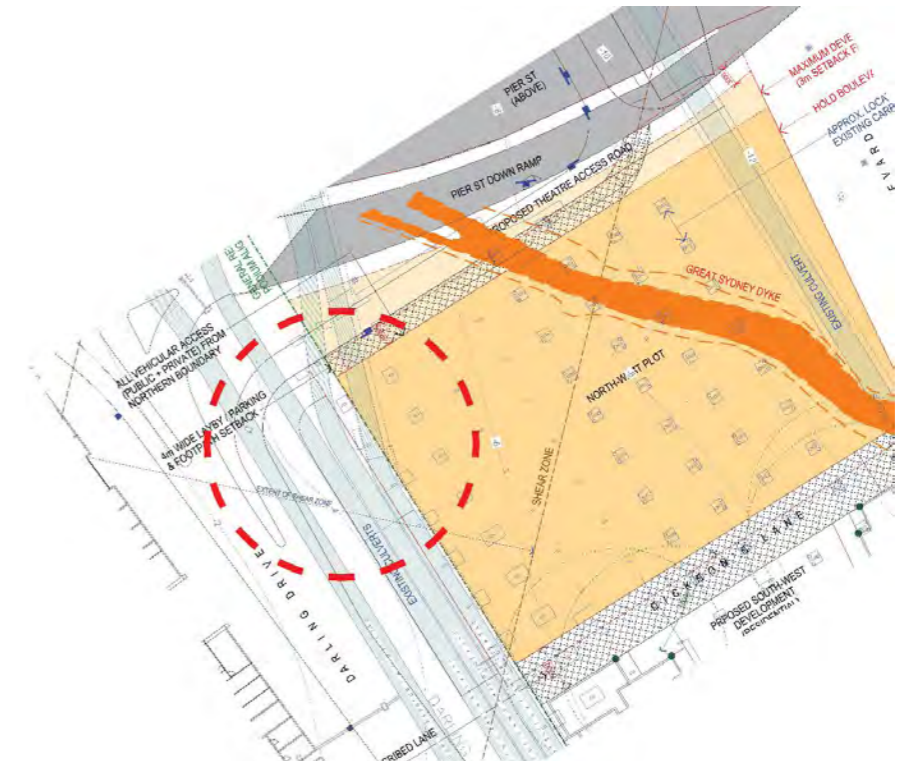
Section 96 NW Plot with existing subterranean services and constraints indicated at the north west corner of the site
